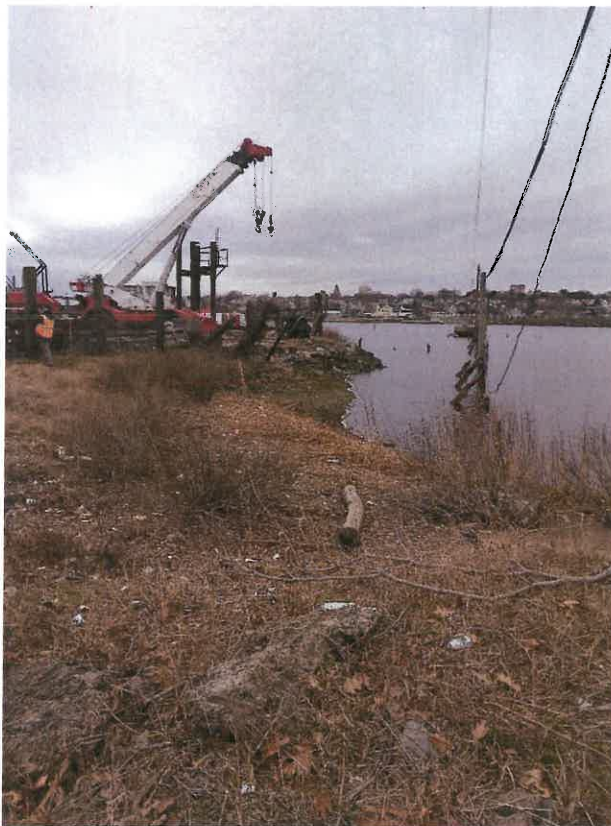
Coastal Feature #10 (Top of bank) at the northeast corner of bridge. See Figure 3.
